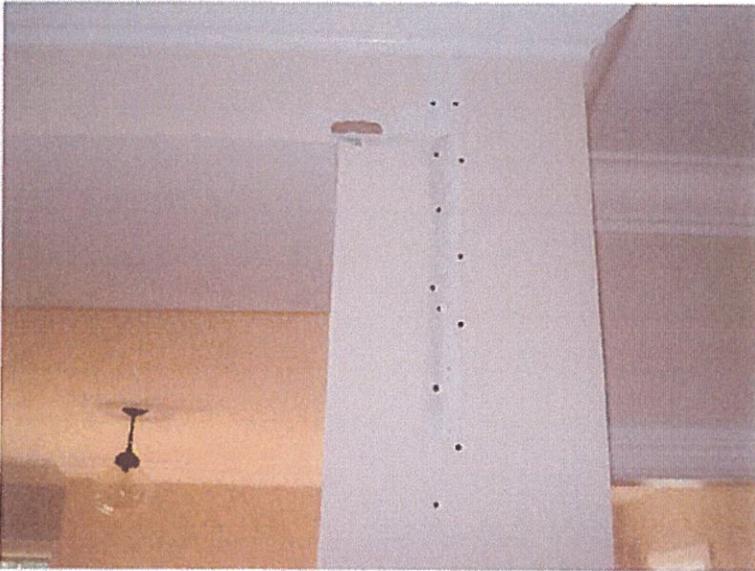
" ongoing cracking in ceiling and walls, kitchen to den, one-story west wing
